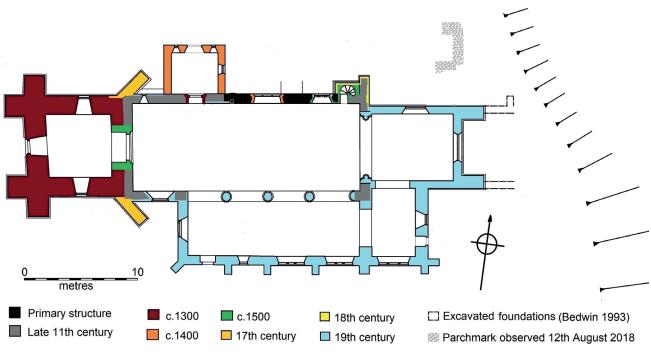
St Mary, Maldon: phased plan (D. Secker)
